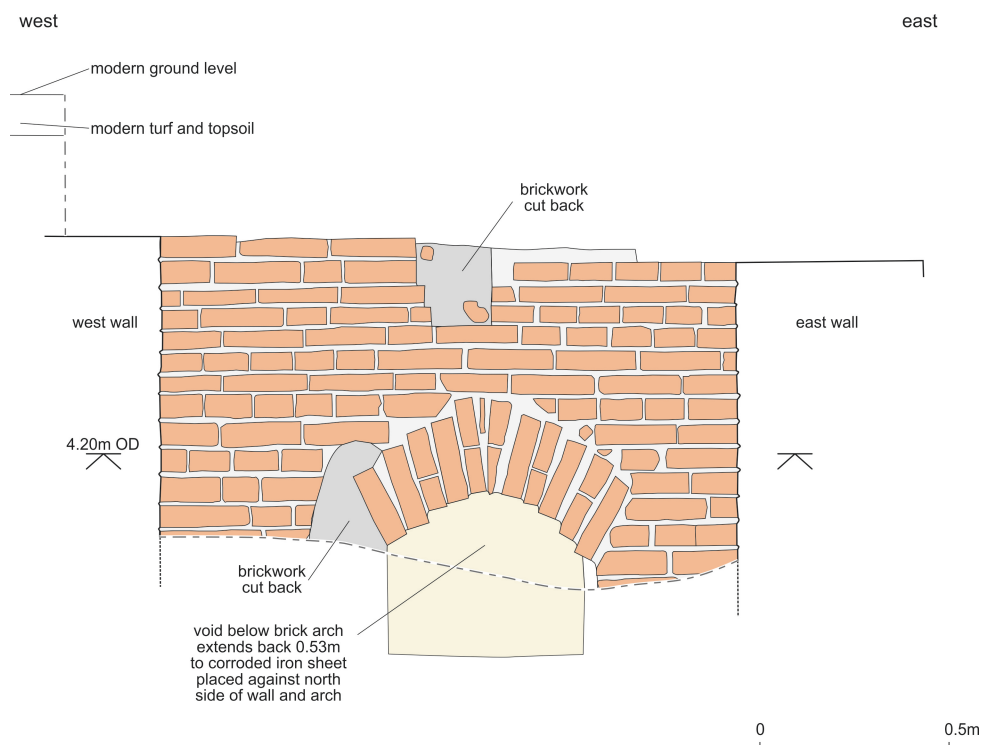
Shene Charterhouse. South-facing elevation of latrine 1. Scale 1:20.
